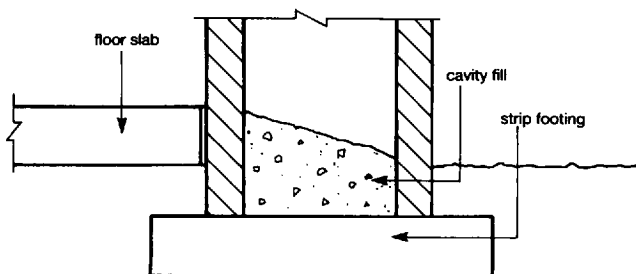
Concrete strip footings are normally adequate for diaphragm walls
